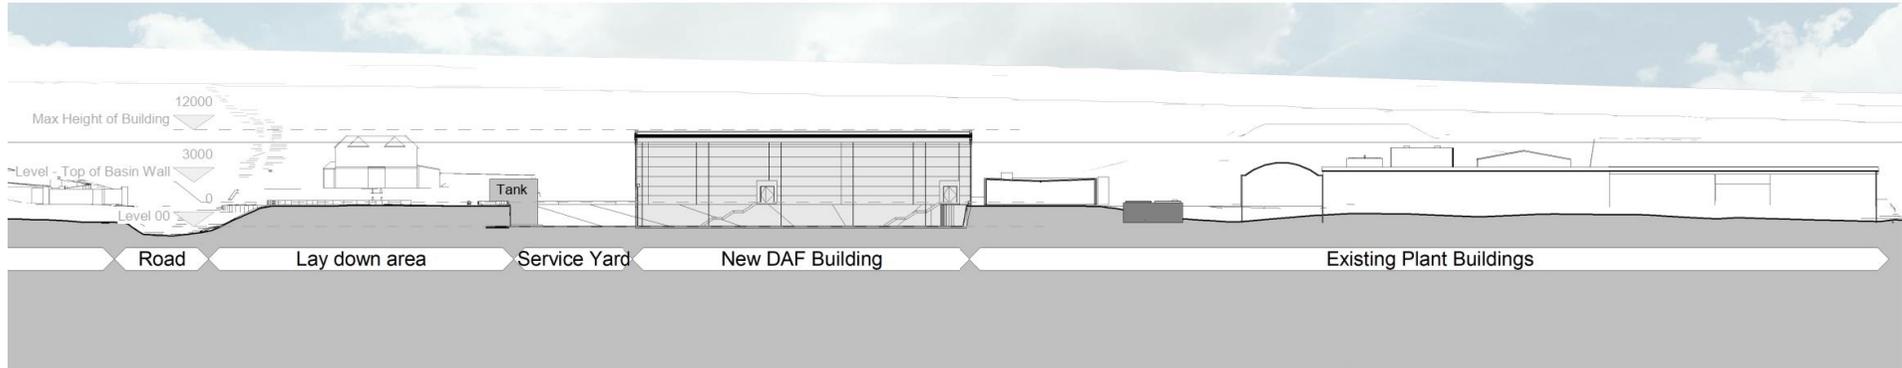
Cross section of new DAF Treatment Building and existing buildings (from the east looking west)
